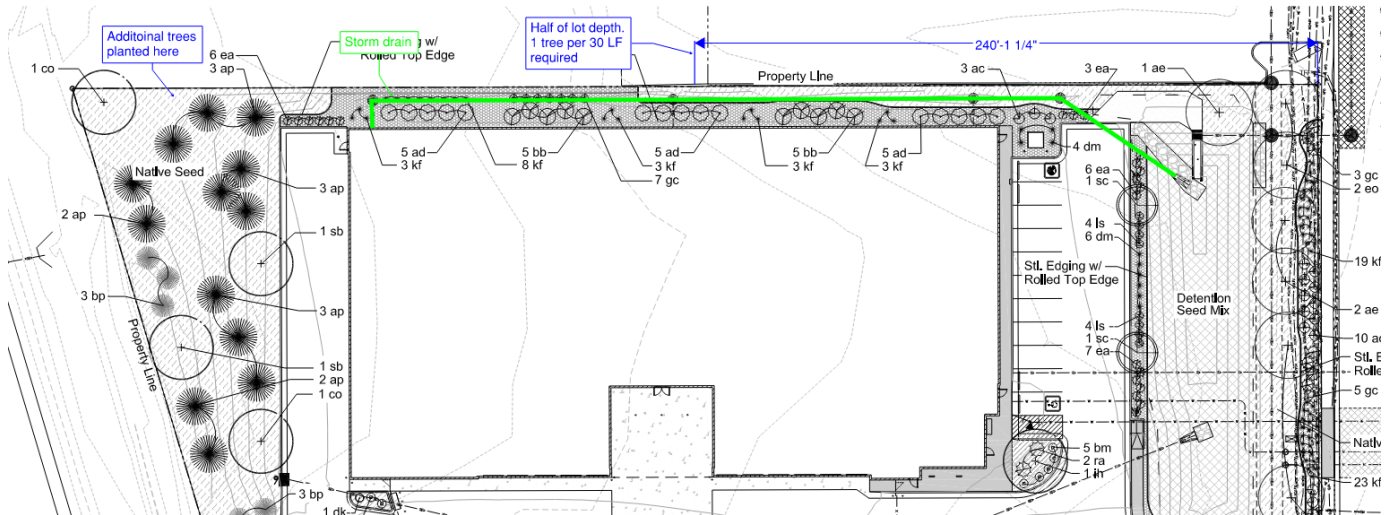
Landscape plan depicting storm drain location, half of lot depth, and tree relocation.
